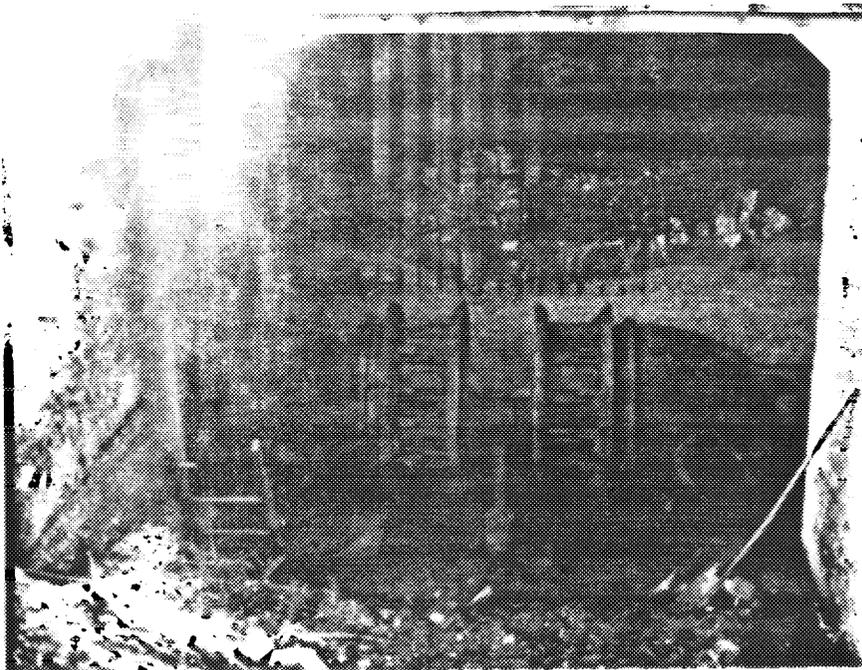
Abandoned turbine looking downstream from fill in outlet channel. Drain holes in floor of concrete structure, allow water seeping through fill to flow back to the river,
